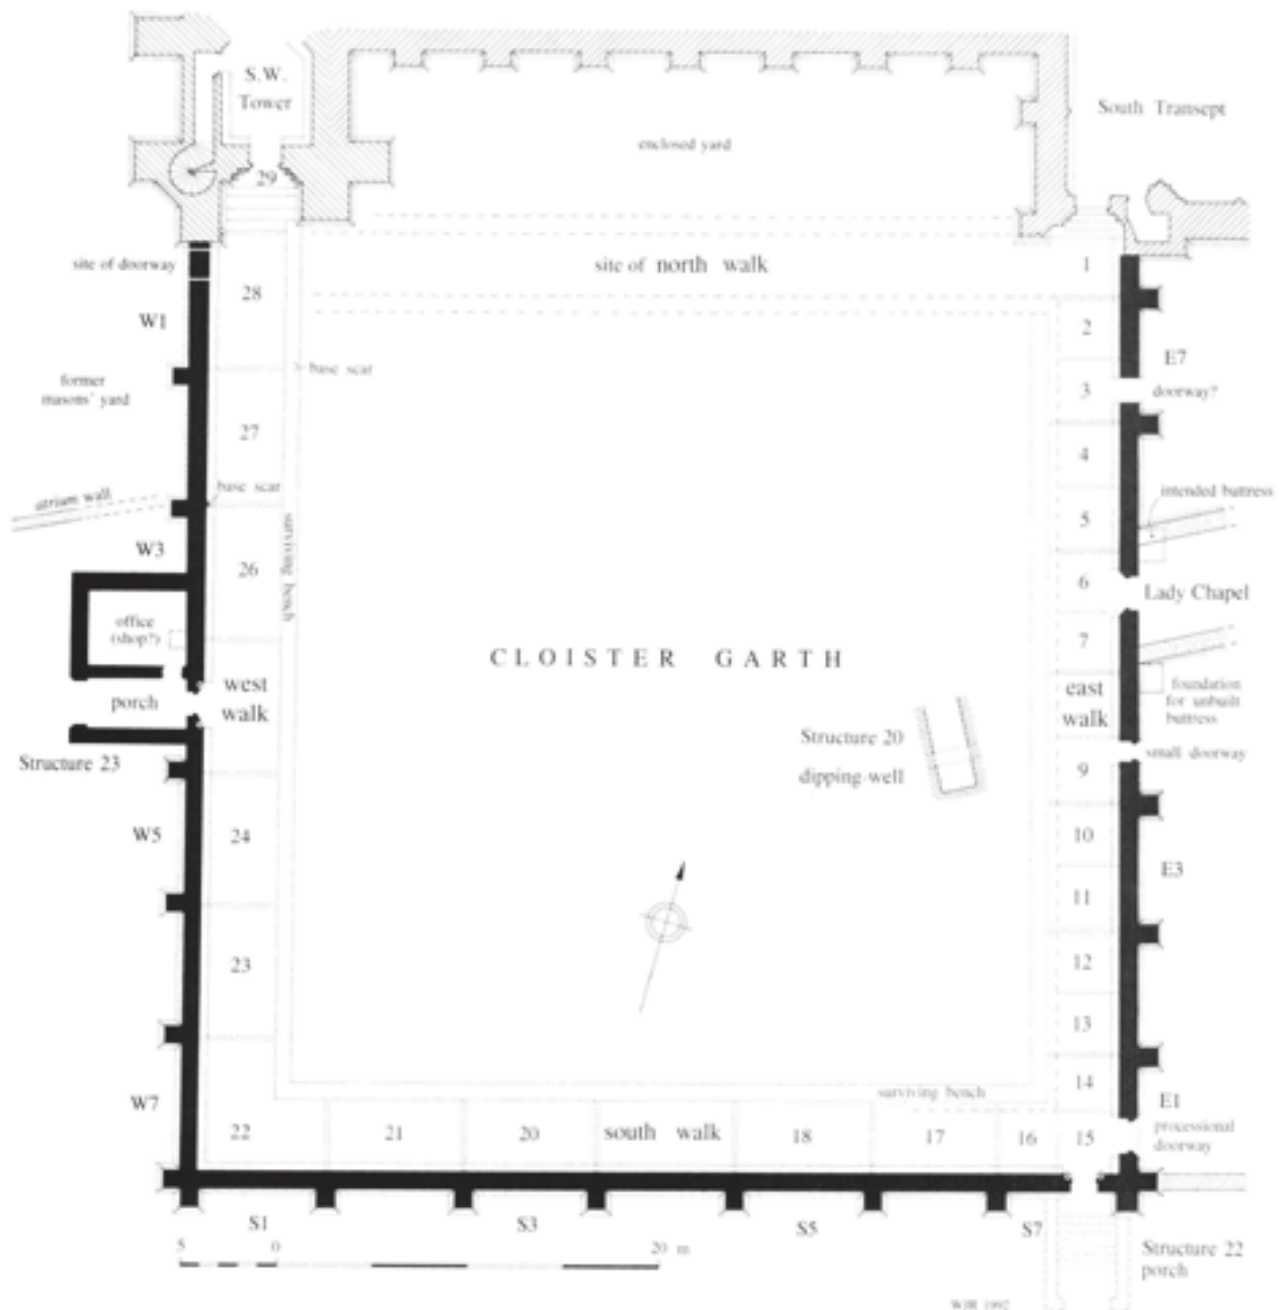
Reconstructed plan of the cloisters in the mid-thirteenth century, showing the single bays of the east walk, and the double-bay units of the south and west walks. Several constructional phases are represented here. Scale 1:400
